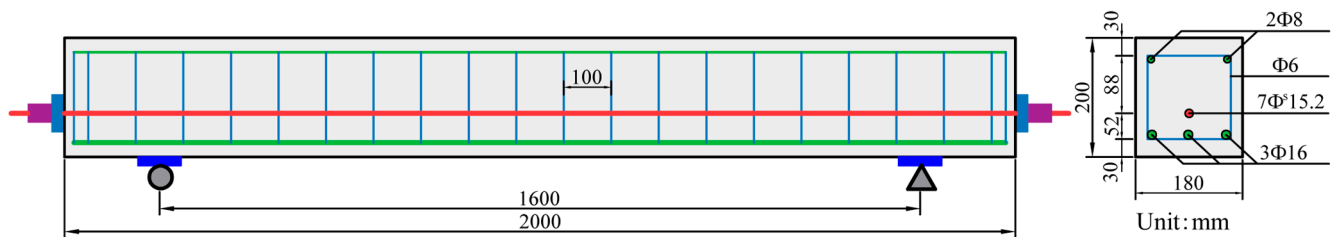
Elevation and cross-sectional reinforcement details of the test beam.
